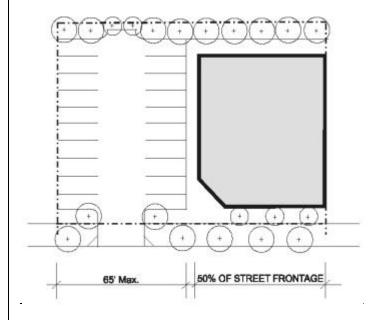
(A): Example of parking width restriction and street frontage requirement.
